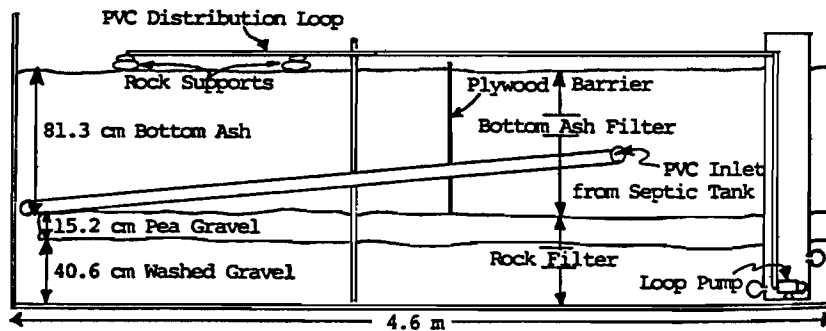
Modified Recirculating Sand Filter (RSF²) Component Details
